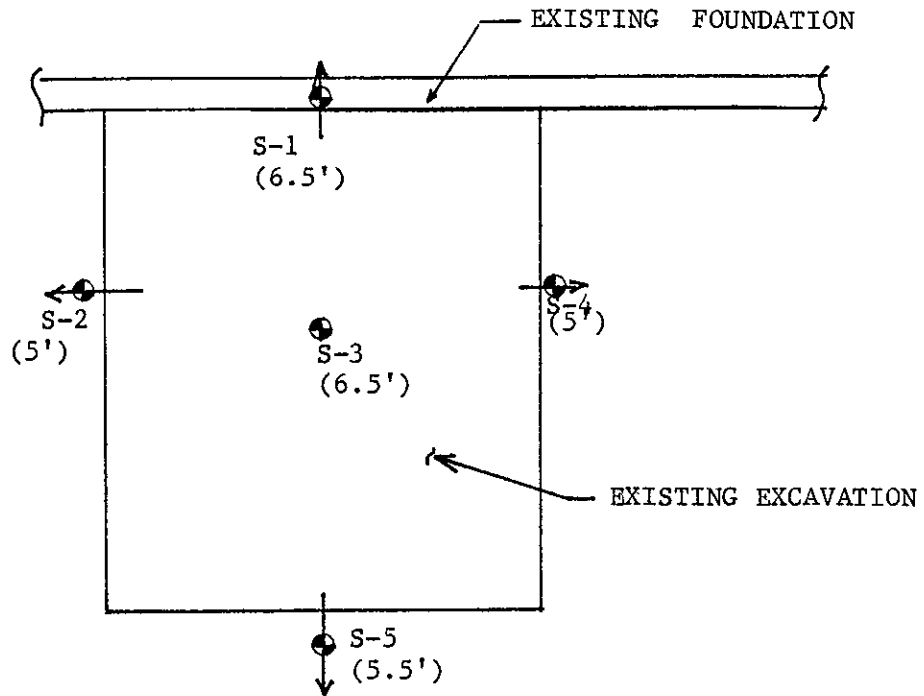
SITE PLAN	CLEMENTINA EQUIPMENT
